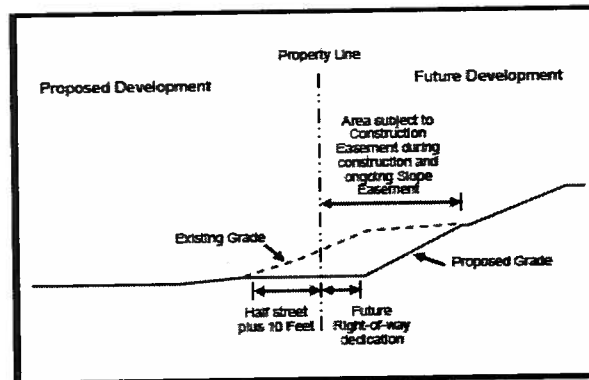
Half-Street Design Cross-section with Slope and Construction Easements
